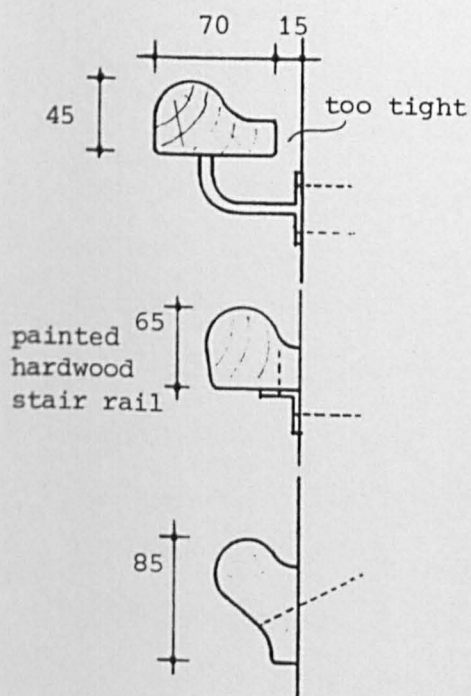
Typical sections of the existing stair rails which were found to be insufficient and difficult to hold firmly.
